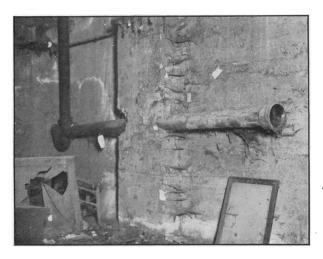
OLD ABANDONED SEWER ENTERING BASEMENT. A COMMON HIGHWAY FOR THE ENTRANCE OF RATS INTO BASEMENTS.
